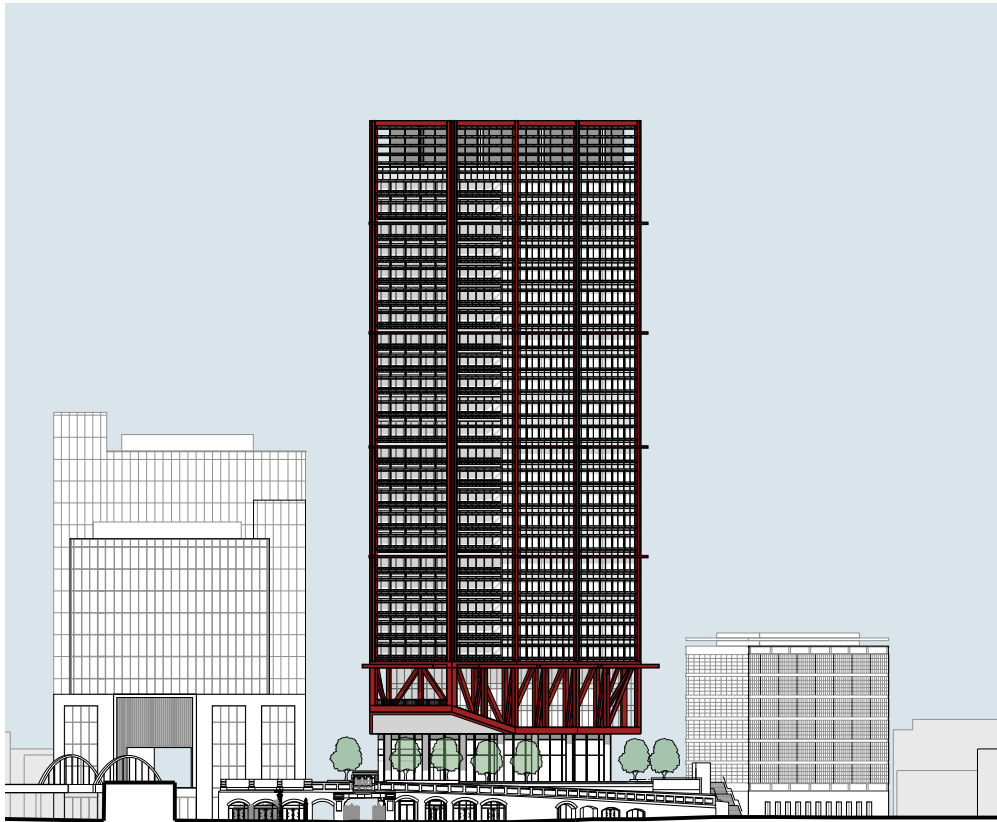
Shoreditch High Street – Revised Elevation with structural framing to projecting Fins
